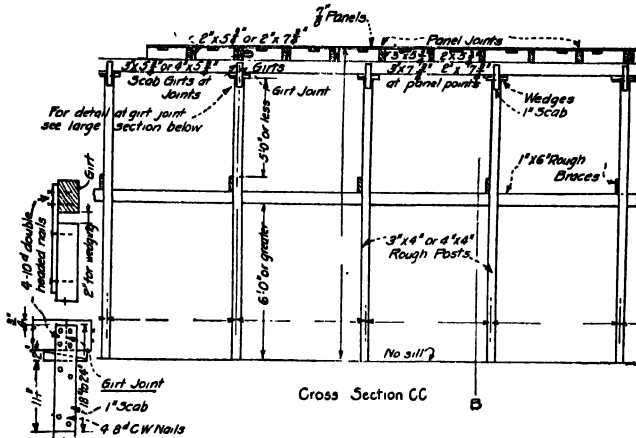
Assembly plan for interior bay—flat slab floor.
